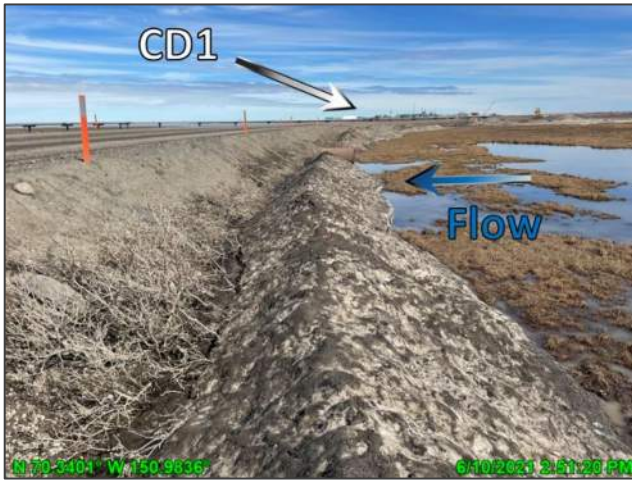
CD2 road embankment in between the long swale and short swale bridge post-breakup, looking southeast; June 10, 2021
